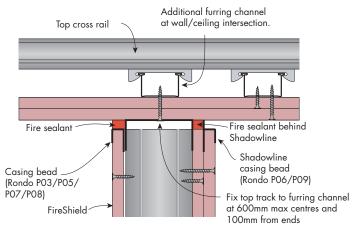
Wall Head to Suspended Ceiling Finishing Detail
